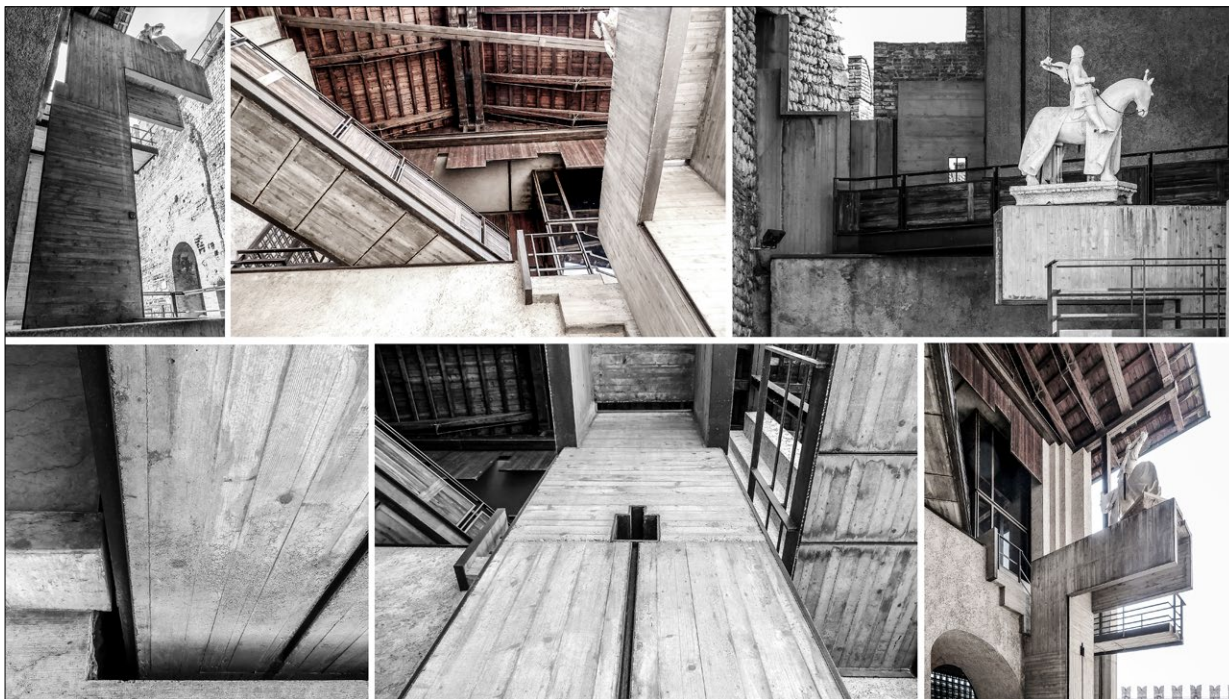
Details of the concrete support made with wooden formwork of the Cangrande della Scala sculpture in the Castelvecchio museum, 2015; photos by A. Ros Campos.
